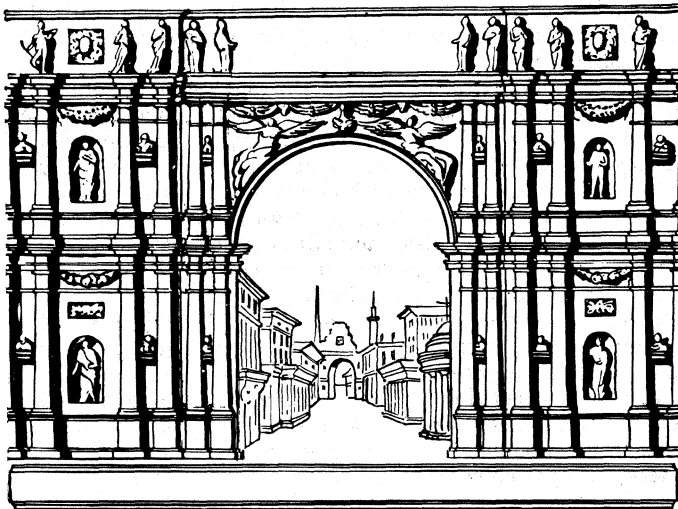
ELEVATION BY INIGO JONES OF A WIDENED CENTRAL VISTA. DESIGNED TO GIVE A PICTORIAL BACKGROUND AND PROVIDE ACTING SPACE WITHIN THE VISTA
